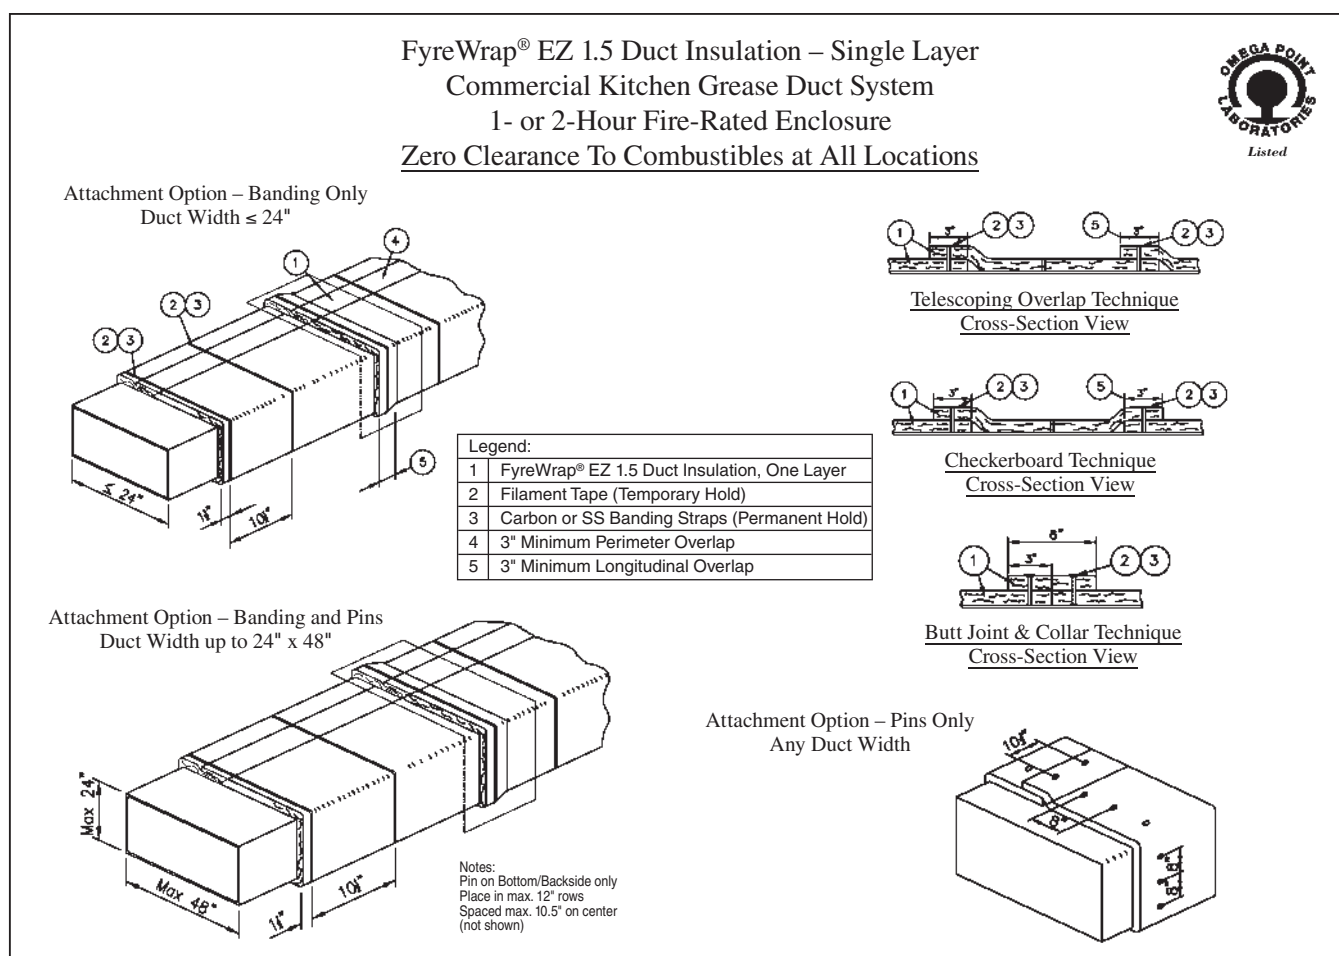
FyreWrap EZ 1.5 Single-Layer Installation Techniques
